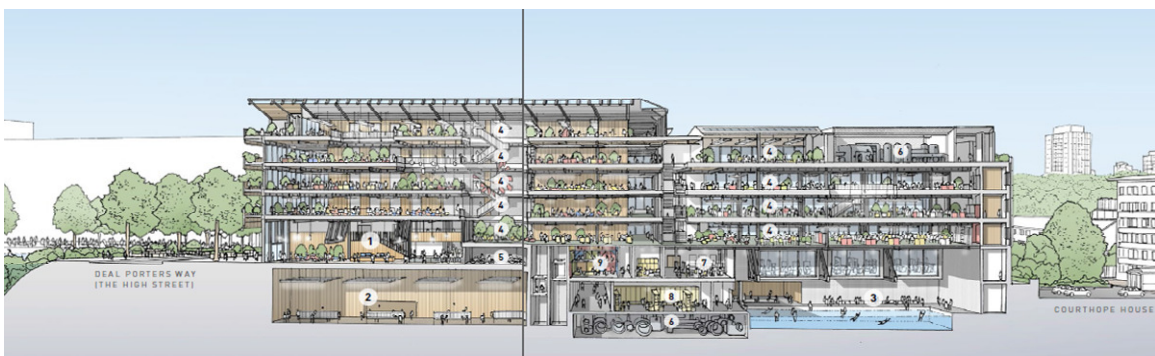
Section through A2 with Canada Water Dock on the left and Courthope House on the right
